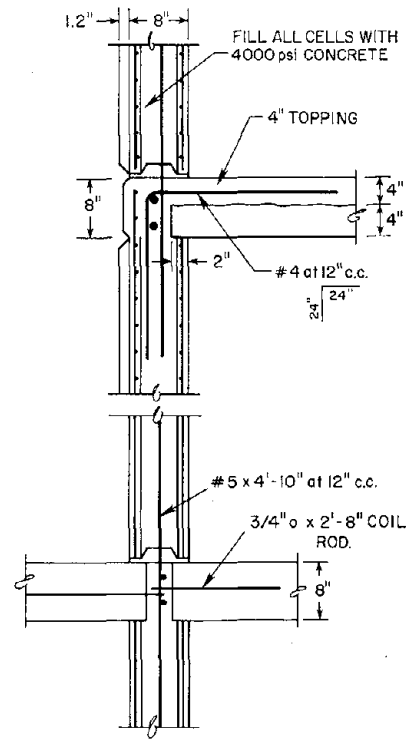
TYPICAL WALL-FLOOR JOINT CONNECTION
